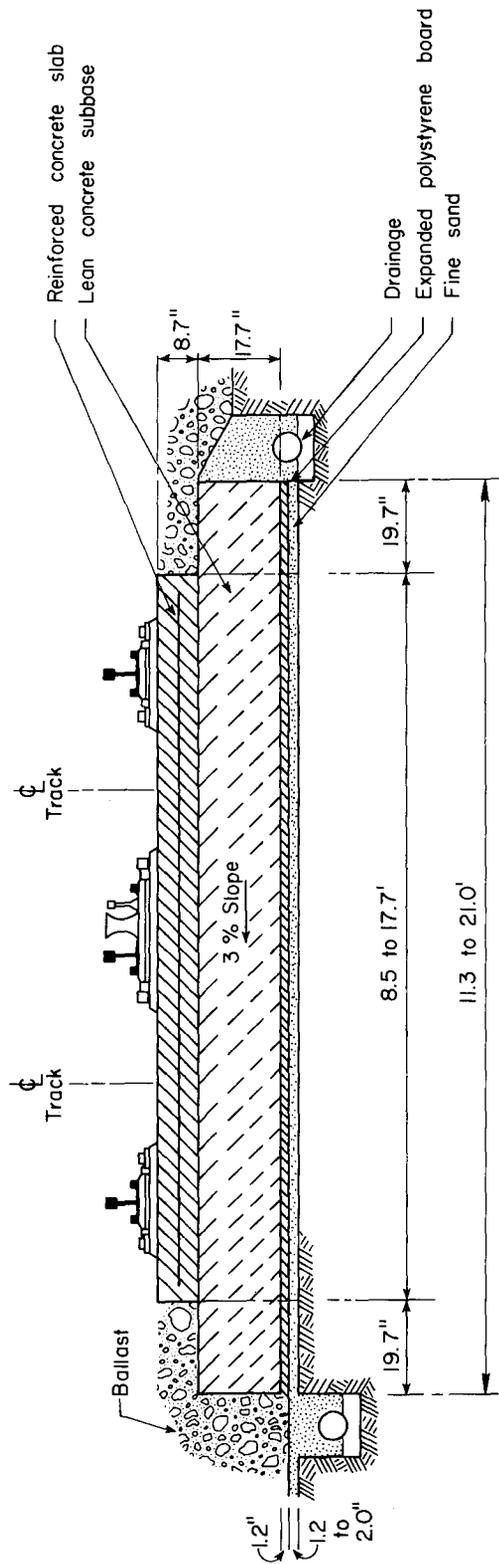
CROSS SECTION OF TURNOUT ON SLAB AT RHEDA
